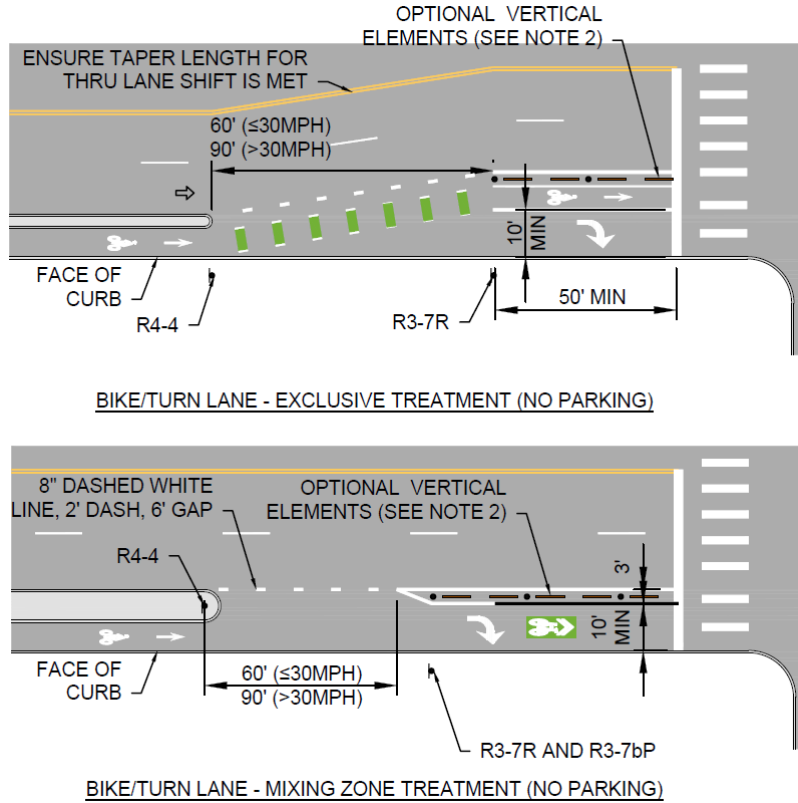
Typical Layout of One-way Separated Bike Lane and Right Turn Lane
